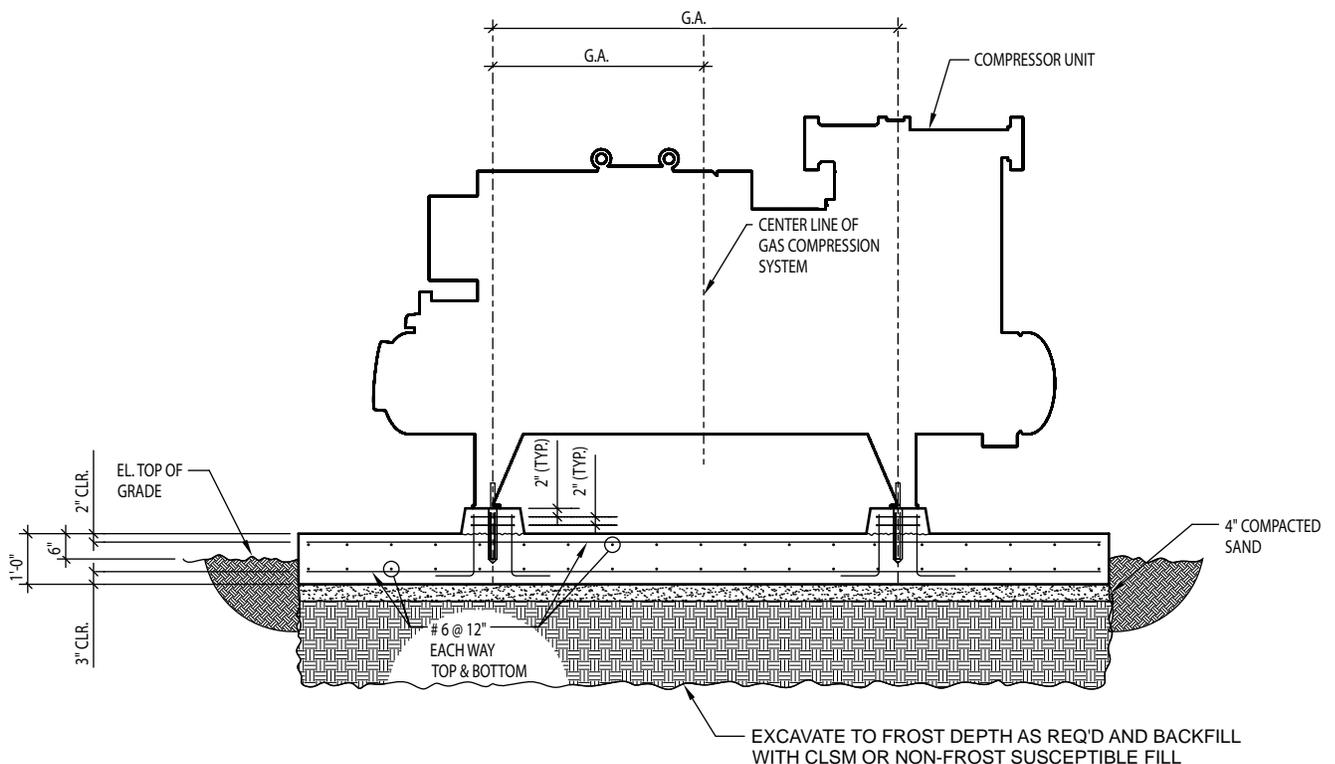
Concrete Pad with Compressor Unit Dimensions - Side View
